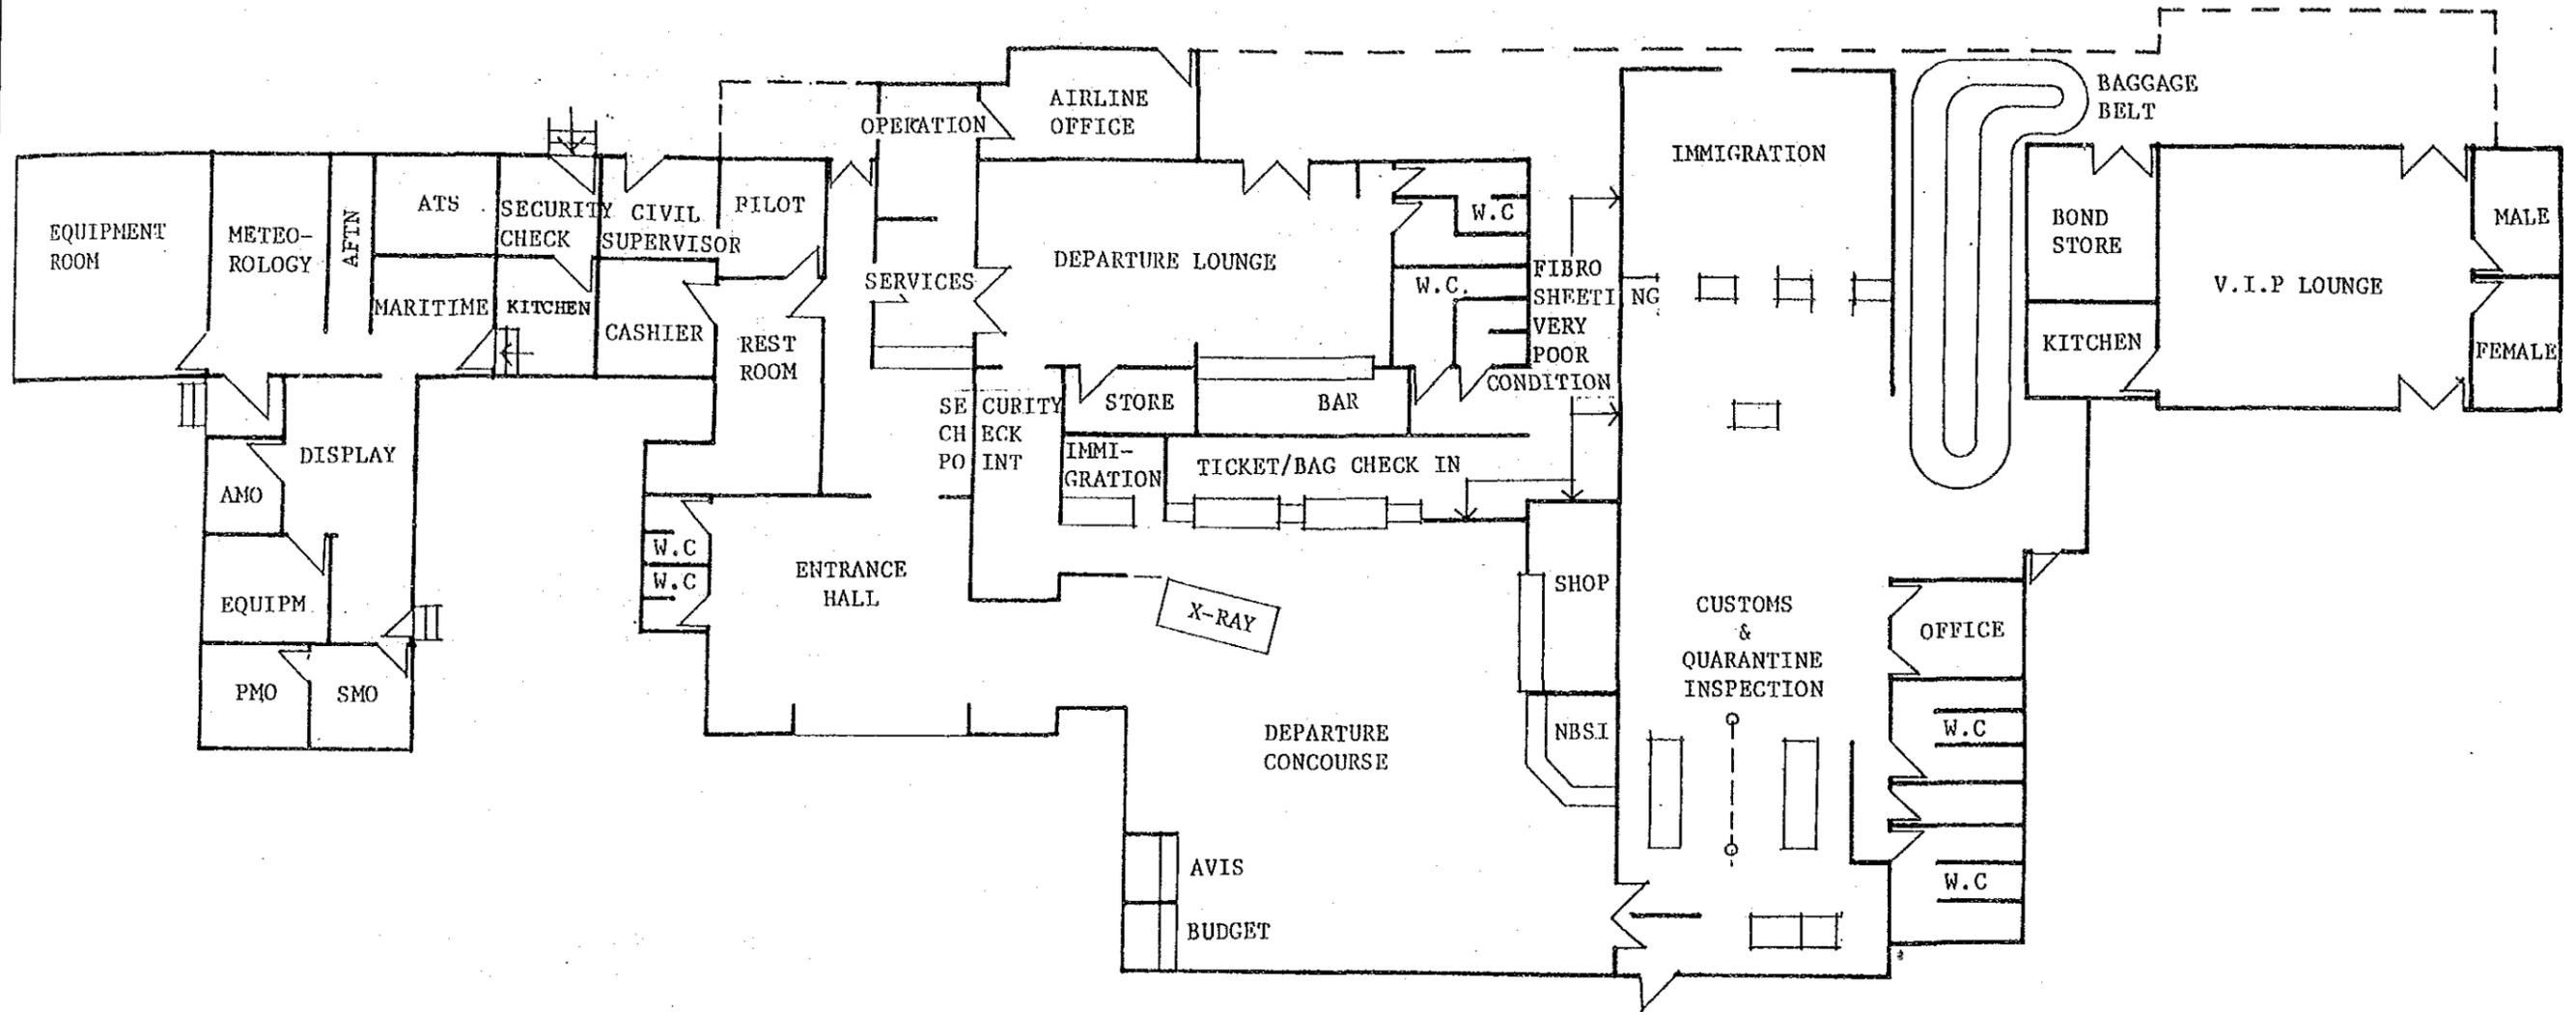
Floor Plan of Existing Passenger Terminal Building
